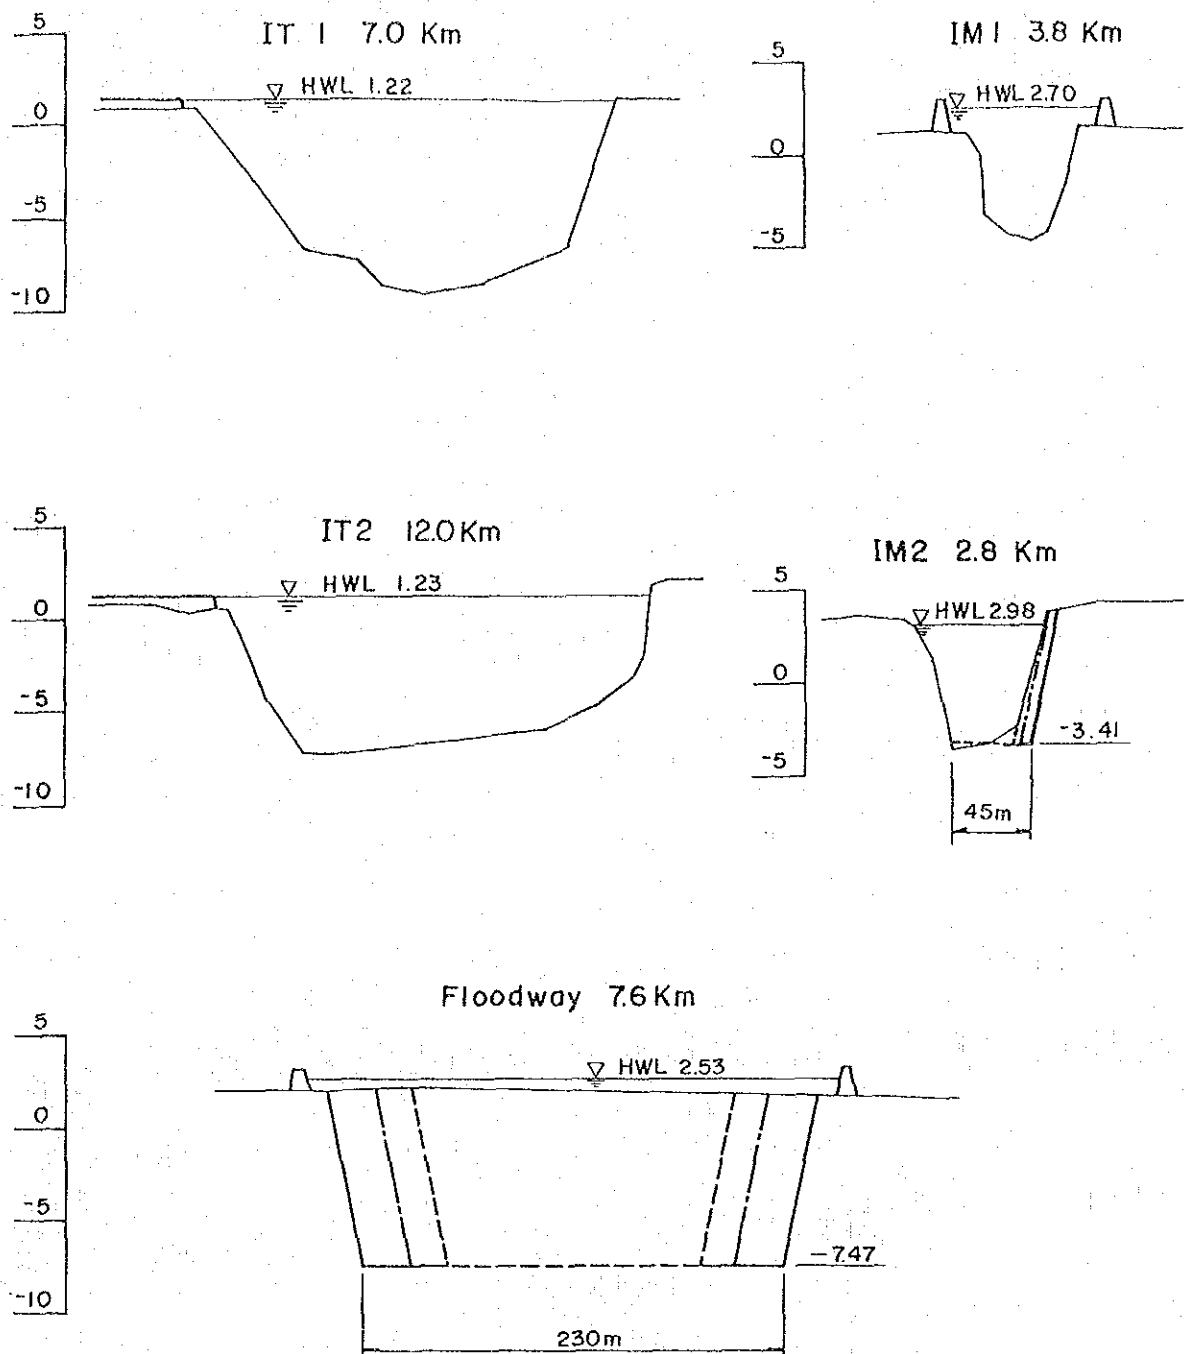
RIVER IMPROVEMENT PLAN IN ASCURRA STRETCH
